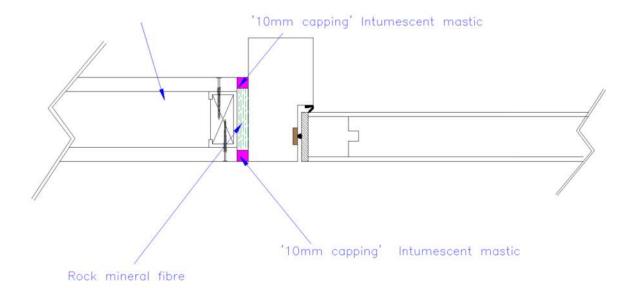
Details of Supporting Construction to Frame, Fire Stopping
